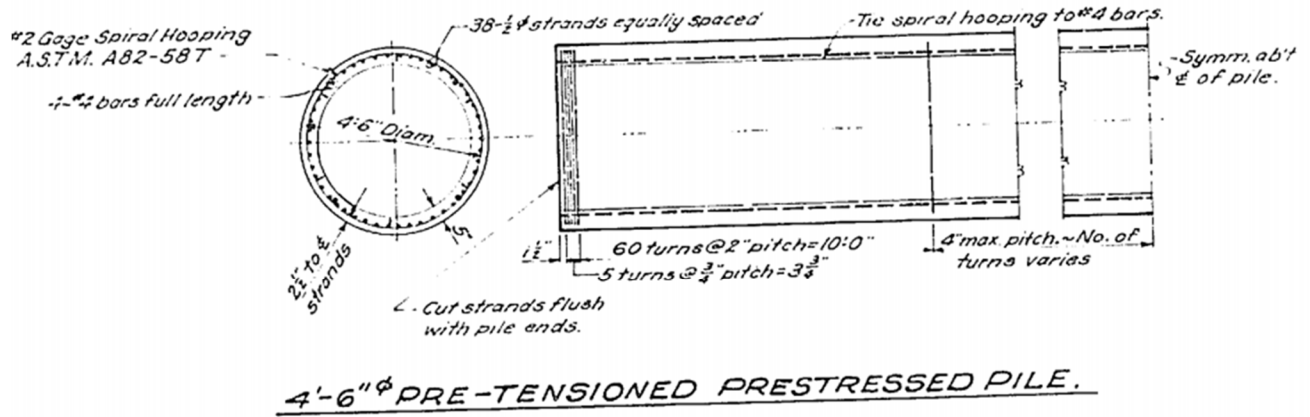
Details of Hollow Prestressed Concrete Column-Pile (Slide)
